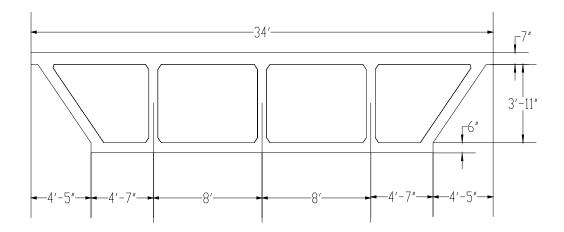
Cross Section of 1RWL-2RWL Off-Ramp Bridge Deck (reinforcement not shown, drawing not to scale)
